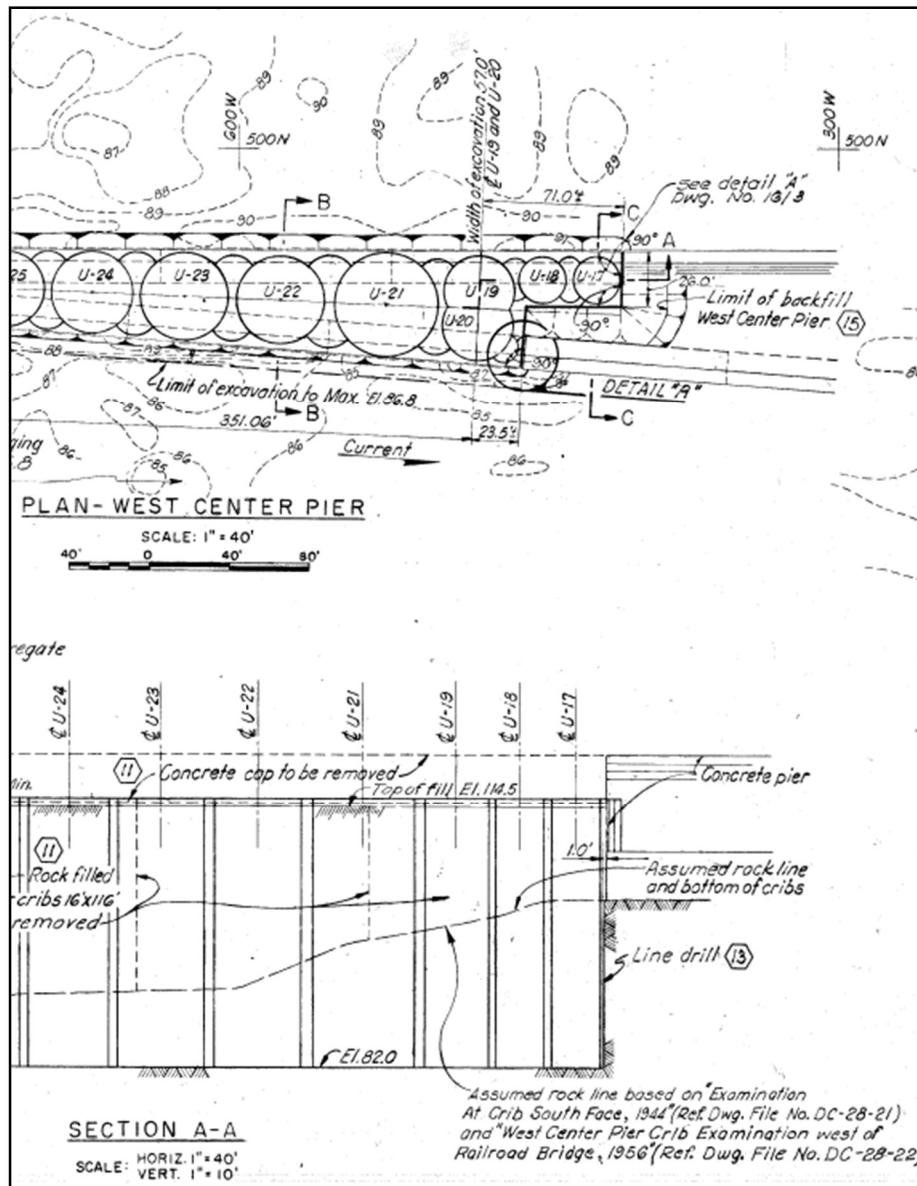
1964 WCP Extension Drawings – Demo Plan & Elevation
